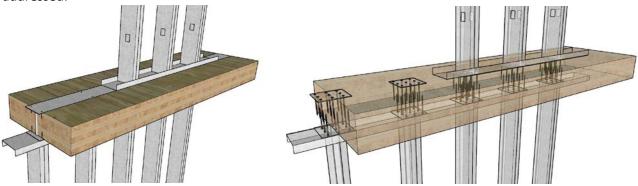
Option 1 - load transfer using STSs: continuous steel plate (left); and Discrete steel plates (right)
